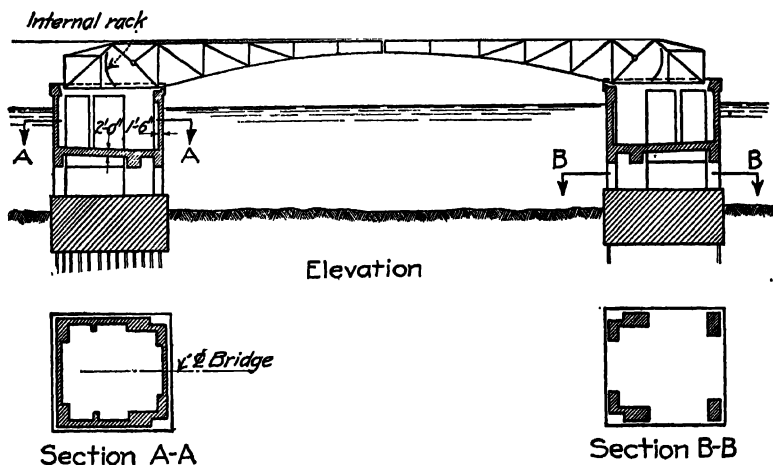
Bascule Bridge over Young's Bay, Astoria, Oregon, built 1920.
